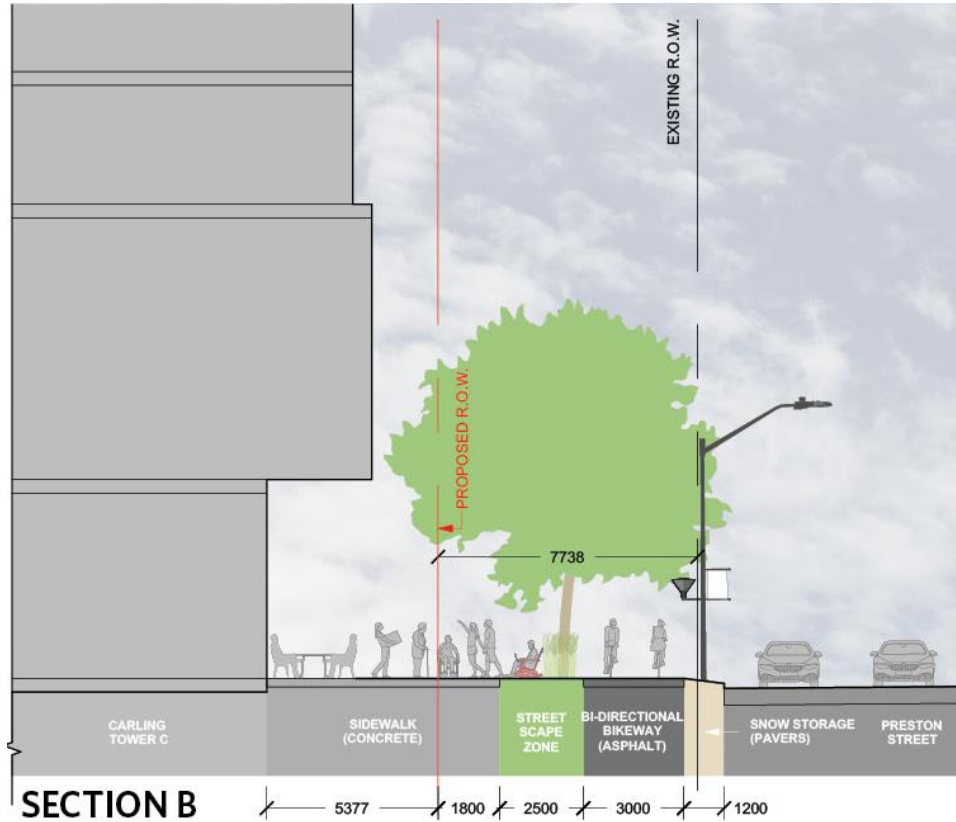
Master Site Plan - Public Realm Section at Preston Street
